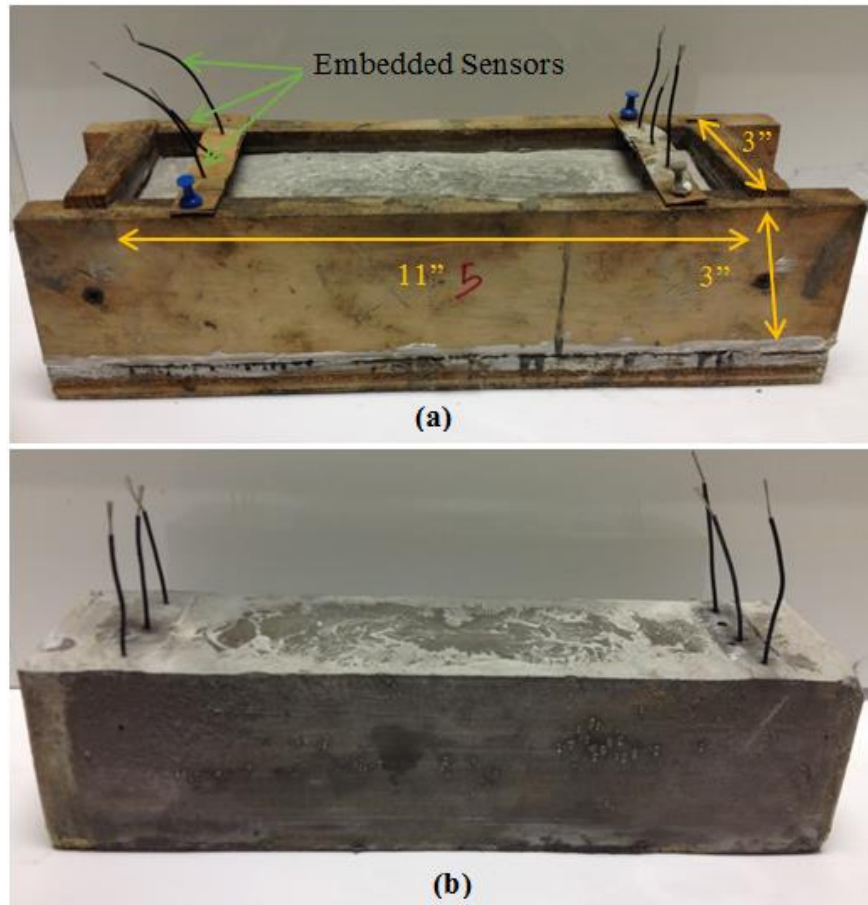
(a) Mold Used to Prepare Flexural Specimen (b) Beam Specimen
